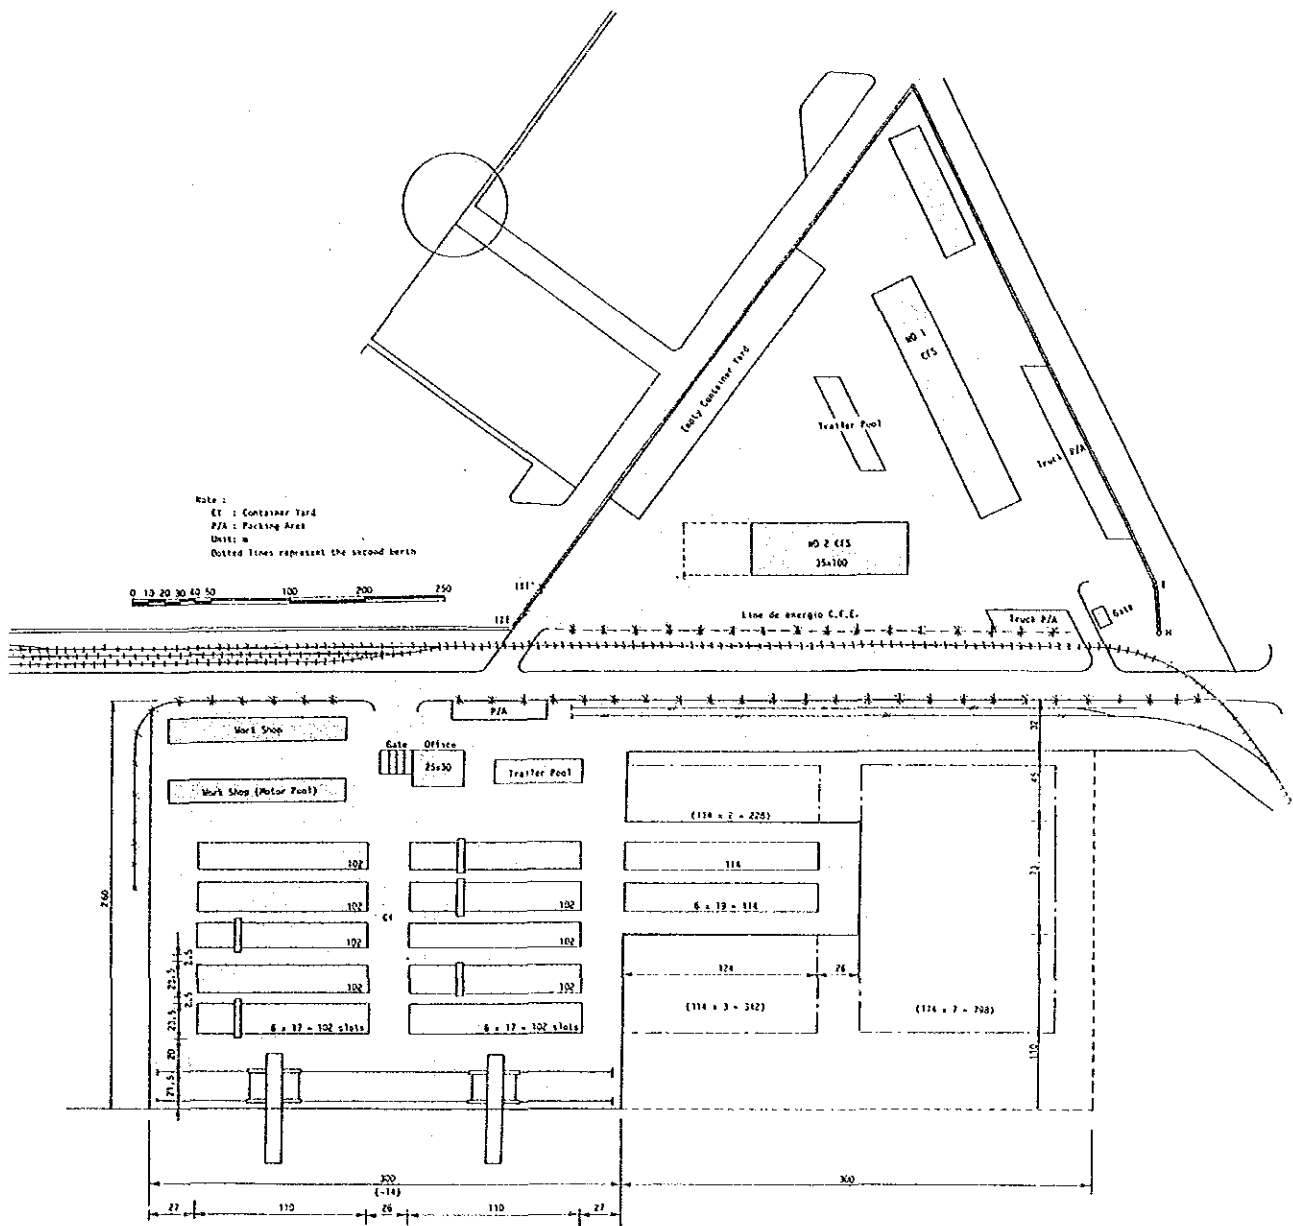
Layout Plan of New Container Terminal - Rubber Tyred
